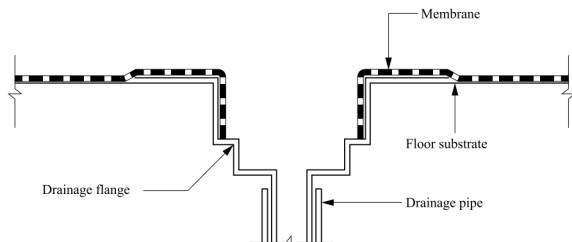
TYPICAL MEMBRANE TERMINATION AT DRAINAGE OUTLET
